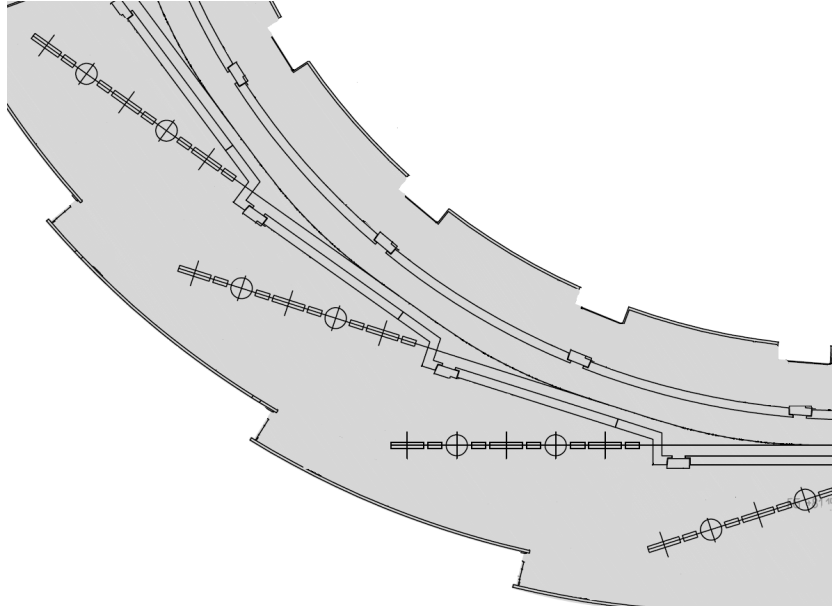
Detailed floor plan of MAX IV with beam lines, [12].
